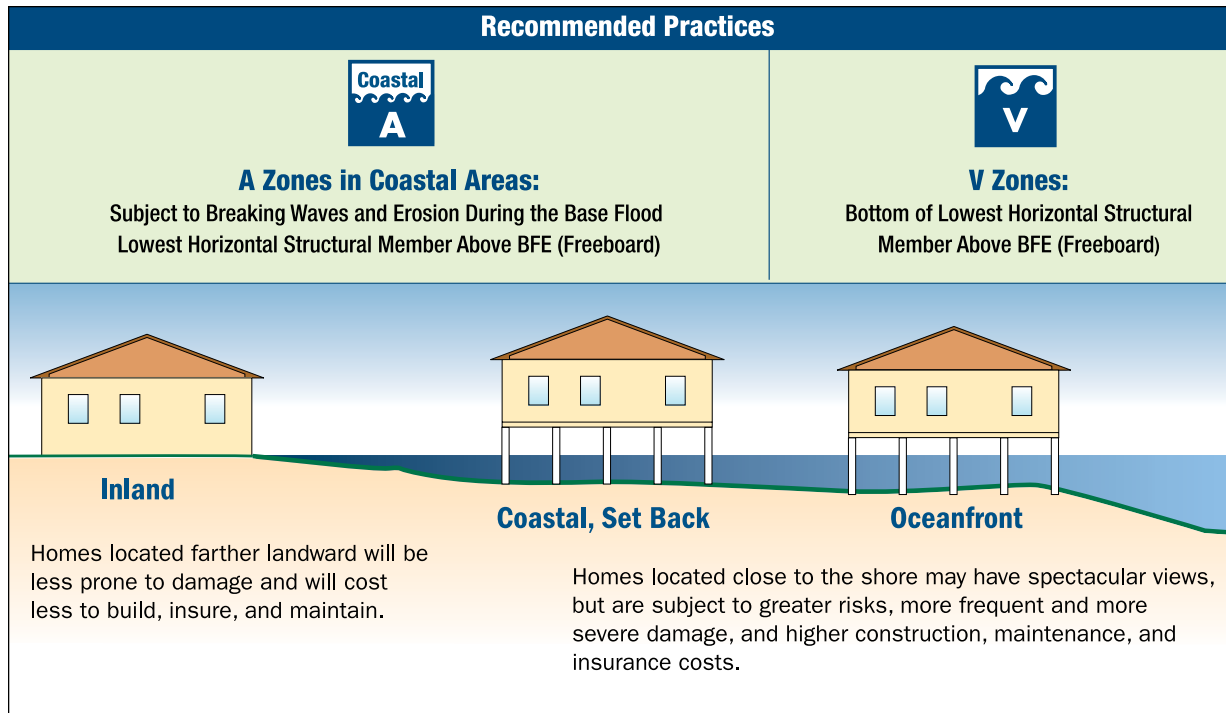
Recommended Open Foundation Practice for Buildings in A Zones, Coastal A Zones, and V Zones.
